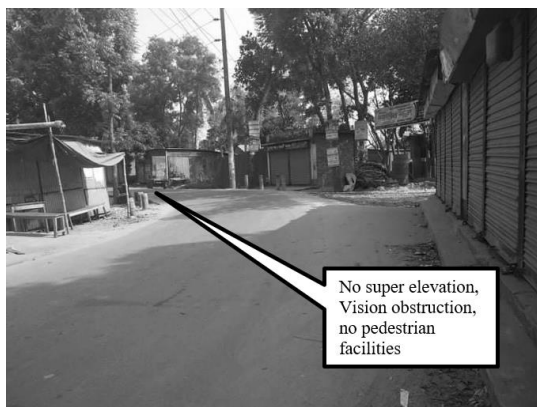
No super elevation, Vision obstruction, and no pedestrian facilities
